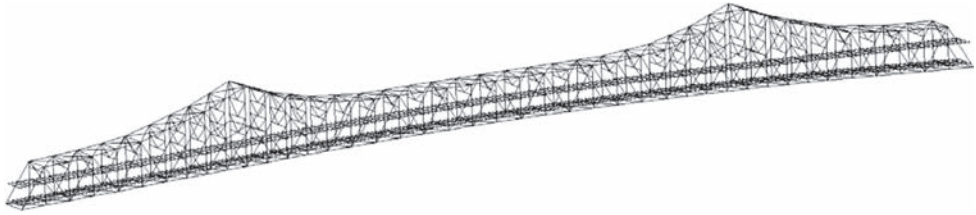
3D “stick” AutoCAD model of the Big Mystic Span.
